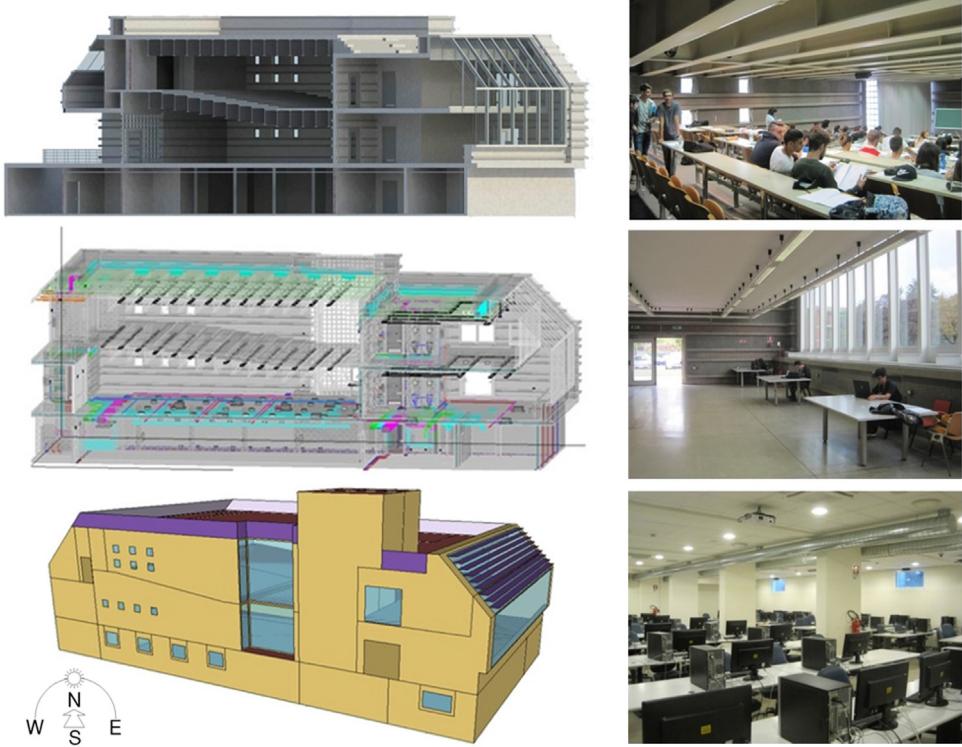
Architectural, MEP (Autodesk Revit) models and energy model (SketchUp/EnergyPlus) of the building and internal views of the aula magna (first floor), atrium (ground floor) and labs (underground).
